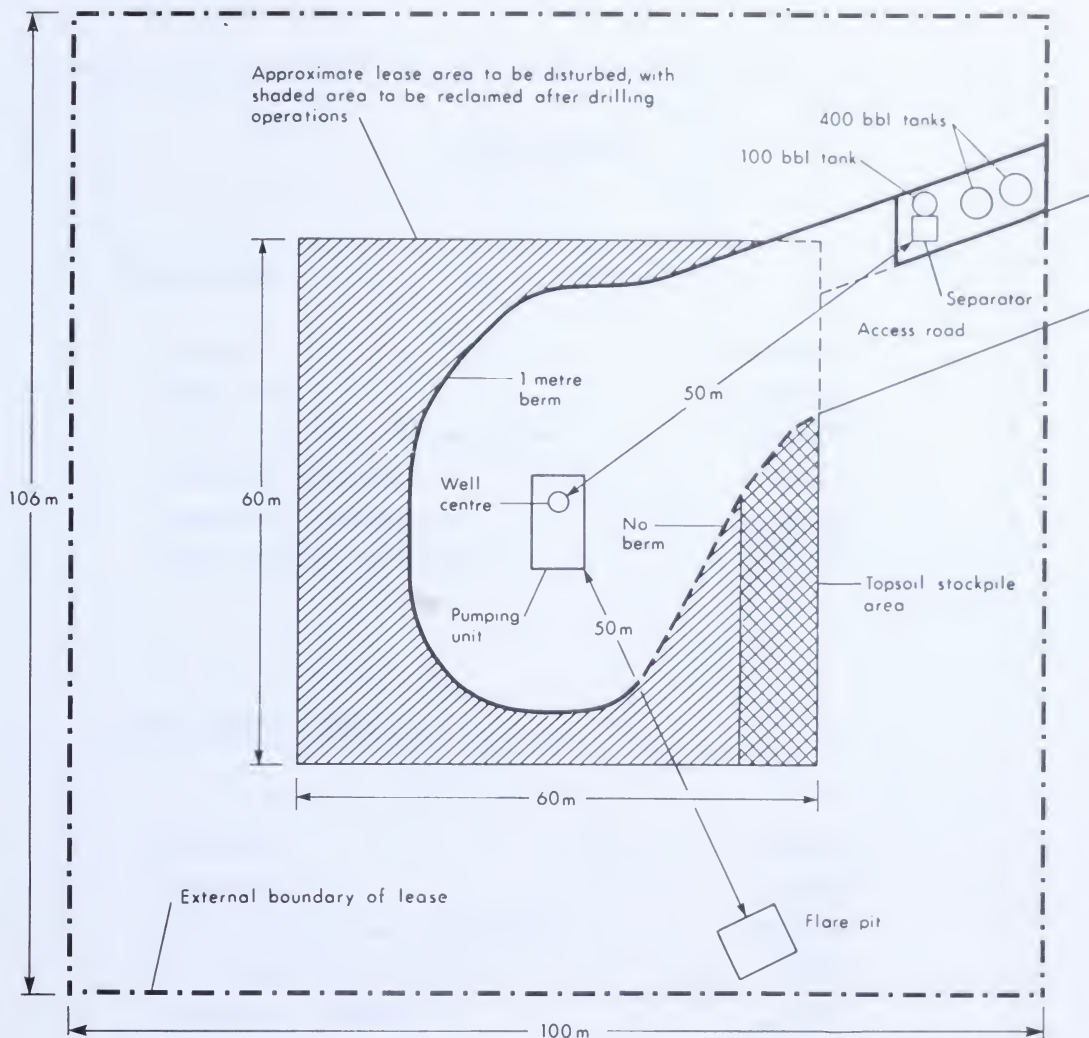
PROPOSED LEASE PLAN FOR BAKKEN OIL WELL
